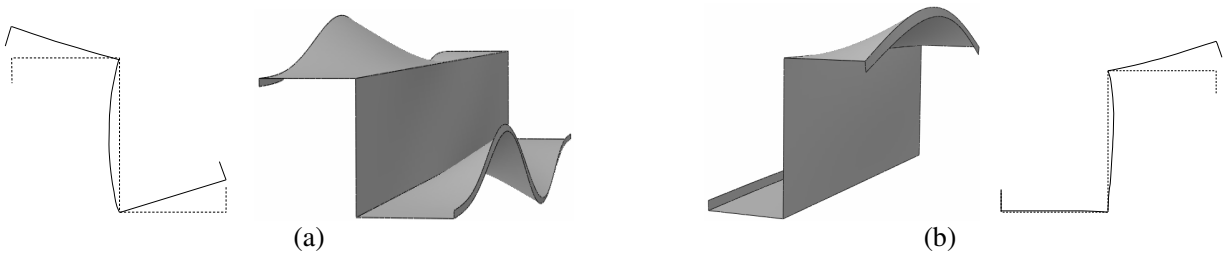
Illustrative distortional buckling mode shapes and buckled cross-sections of zed-section (a) columns and (b) beams
